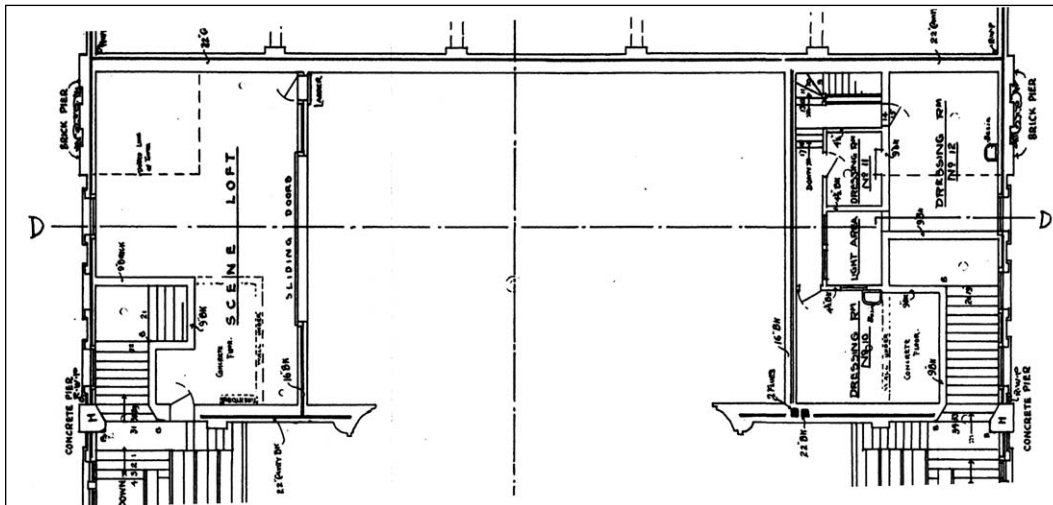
Detail of 1914 plan backstage area at gallery level (HCC A7³).
